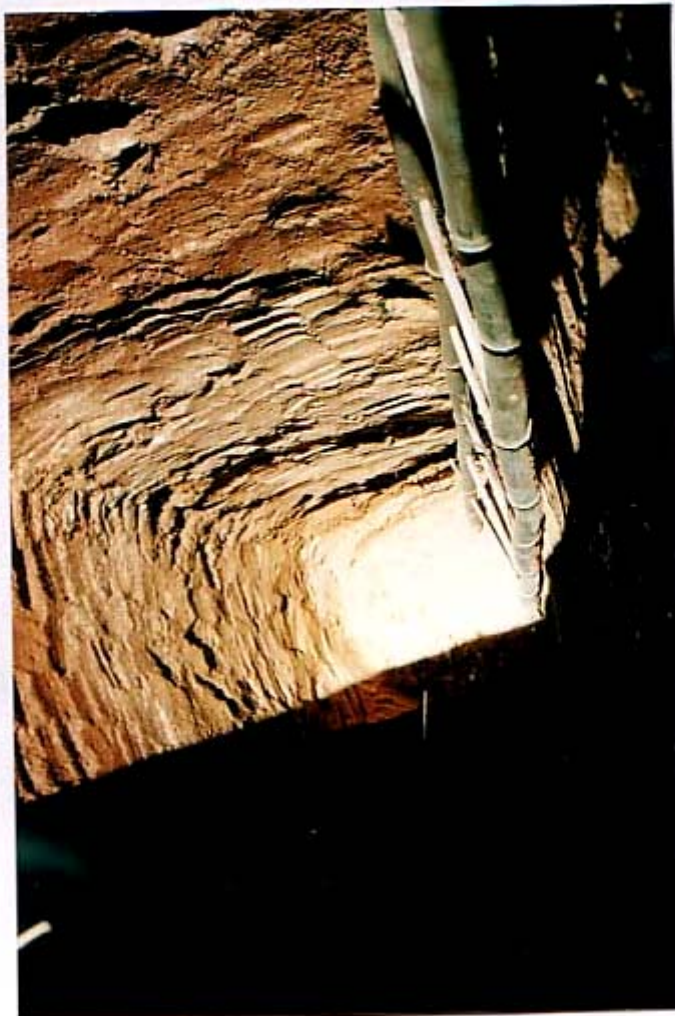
Photograph of Left Bank Test Pit No.5 (1/2)
